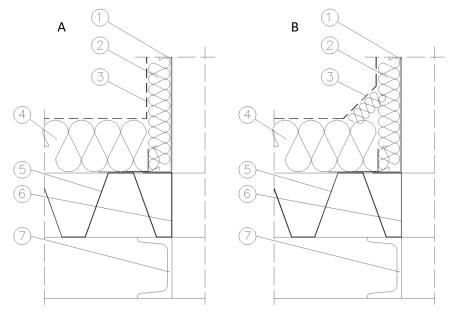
Detail B - Steel base on reinforced concrete slab (A – covering with PVC membrane, B – covering with roofing paper).
